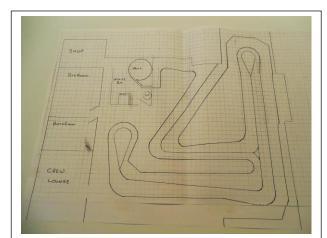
the track plan sketch was used a guide to lay out painter's tape on the floor to guide installation of lights.
